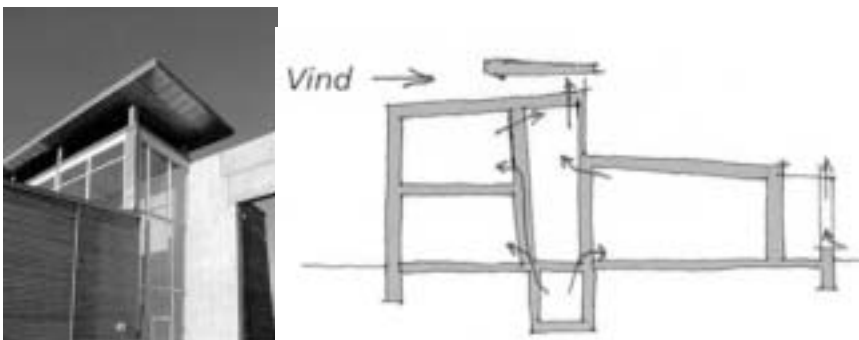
The Kvarterhuset (assembly building) in Kolding, Denmark utilises a two-story tall, centrally located, communication spine as an exhaust stack for the ventilation air. The roof of this stack is provided with a “wing” which is shaped to utilise the Venturi-effect to increase the wind-induced suction over the outlet. The same strategy is utilised in the GSW Headquarters.
